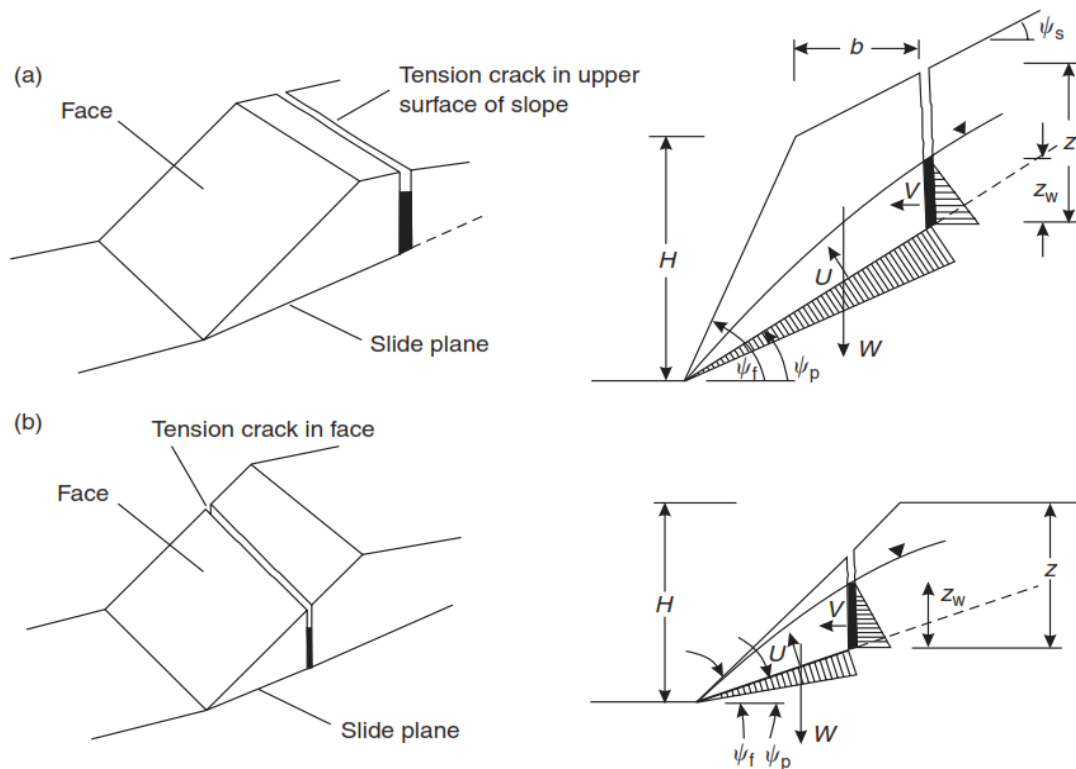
Geometric plane Geometries of plane slope failure: (a) tension crack in the upper slope; (b) tension crack in the face. (Hoek and Bray 1981)
